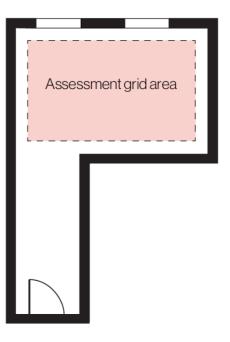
BR 209 Figure C3 – Assessment Area excluding Corridor
